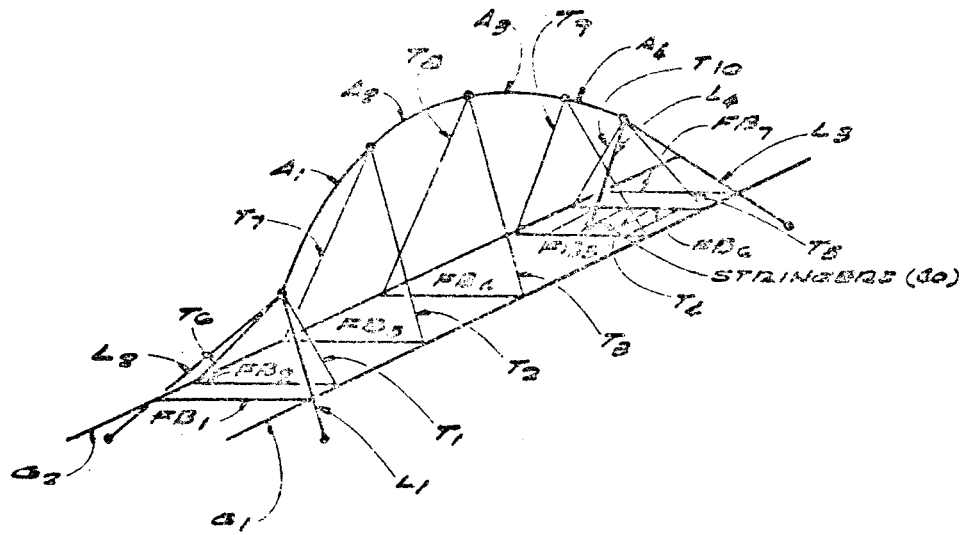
BRIDGE CONCEPT NO. 3: BRACED ARCH
